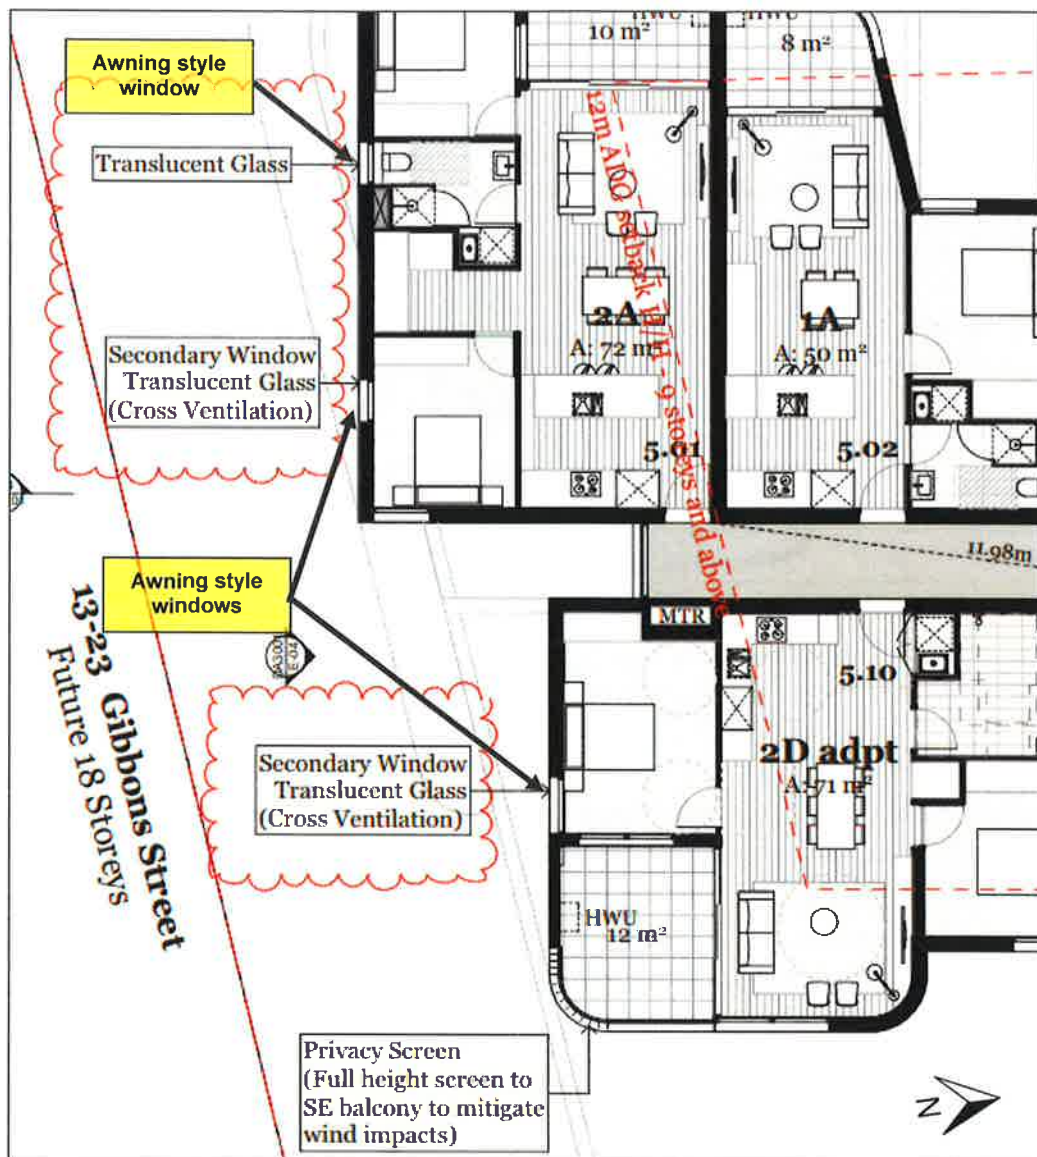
| Proposed privacy mitigation measures for south facing apartments (Base source: Architectural Plans)
